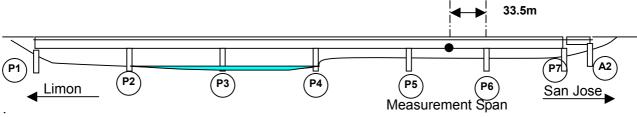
Deflection Measurement Points for No.26 Chirripo Bridge
